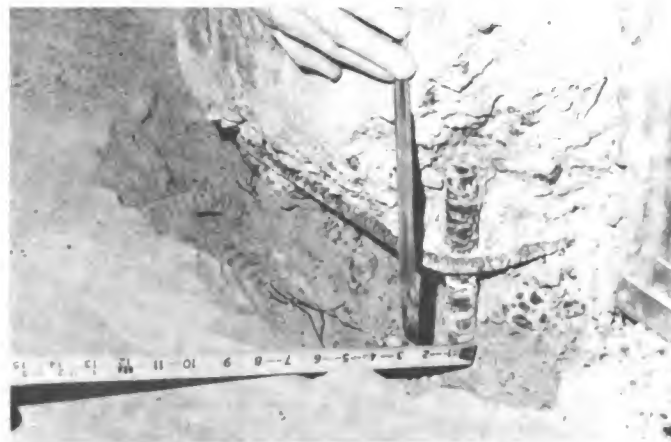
Bank of California. Detail of spalled and chipped area similar to that shown in figure 14. Note that top joist reinforcement was terminated by hooks at column face and was not extended into confined area of column. Brandow & Johnston photograph.
